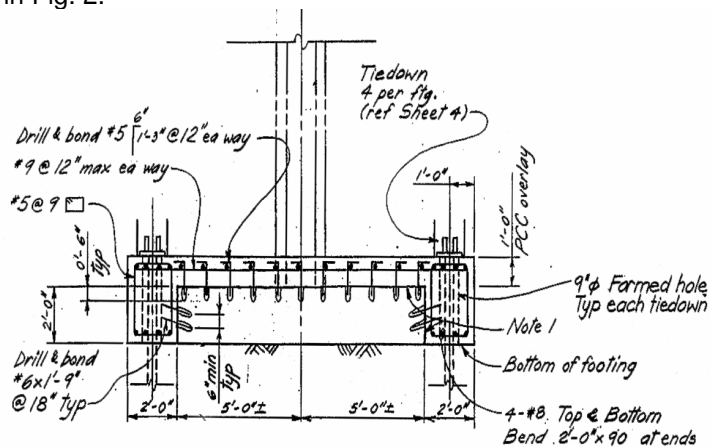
Typical Footing with Tiedown Anchors (PB, 1993).
